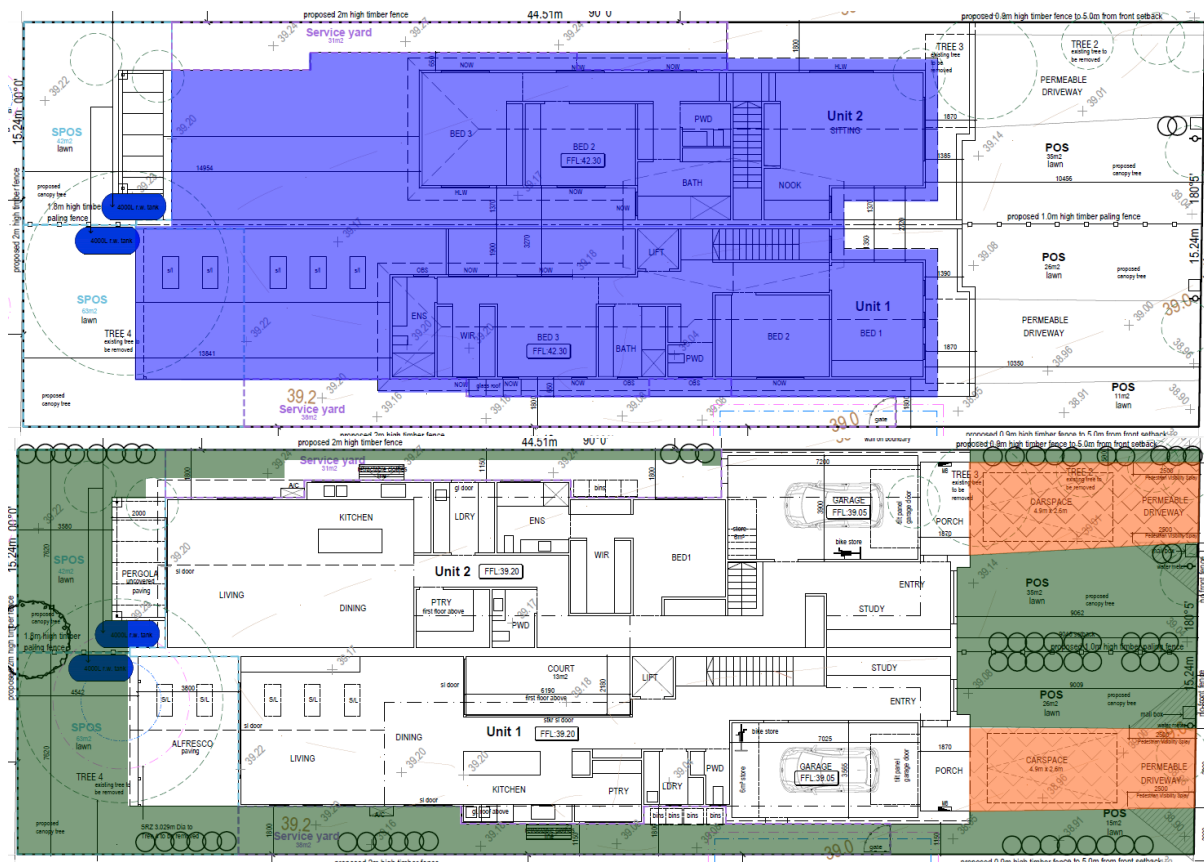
Roof catchment area for each dwelling to RWT (blue), permeable area (green) and permeable driveway (orange)
